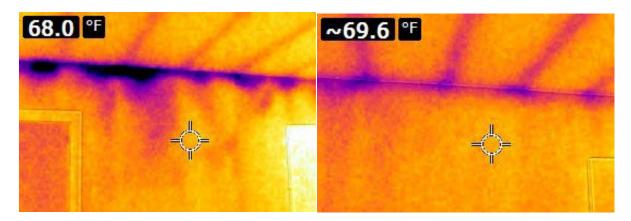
Dining room interior wall top plate leakage reduced from before (left) to after sealing (right)
